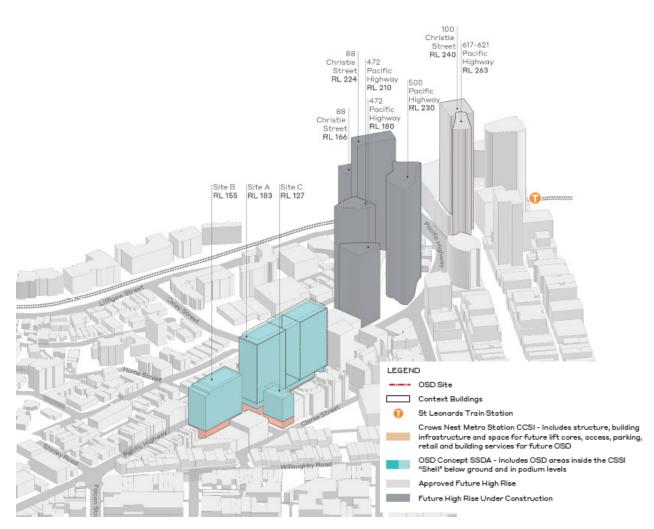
Proposed Crows Nest OSD building envelope (axonometric diagram) and future high rise development in the St Leonards Town Centre
